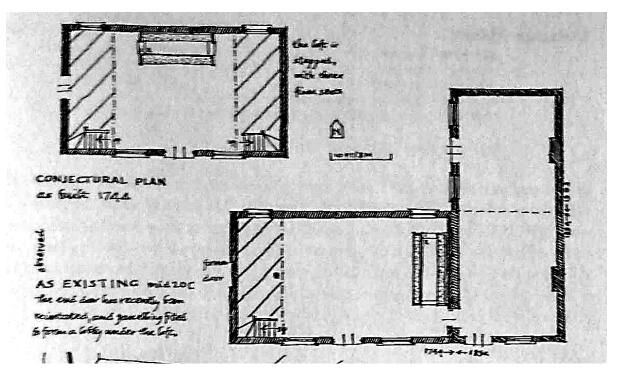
Plan as existing in mid-twentieth century and conjectural original plan, from Butler, p.439
